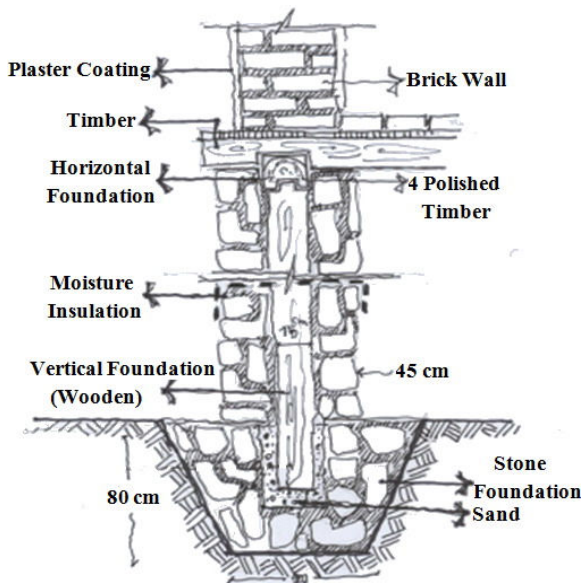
Detail of load bearing wall with vertical foundation in Ush Tobin Village Houses
